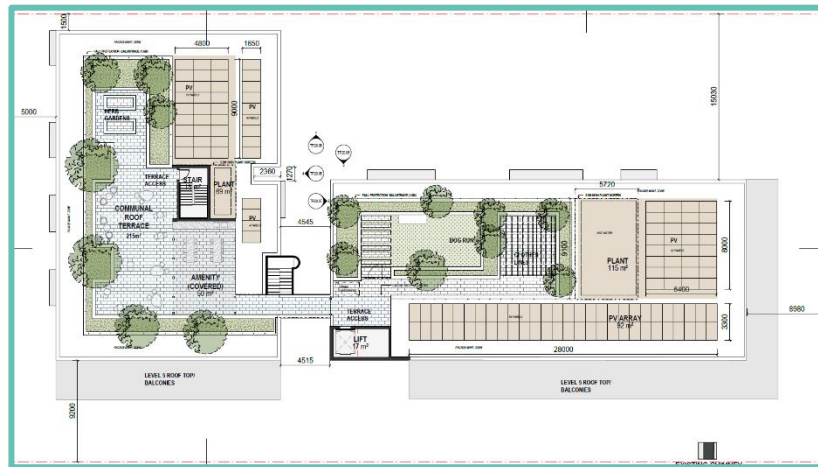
Roof terrace plan. Source: Warren and Mahoney.
